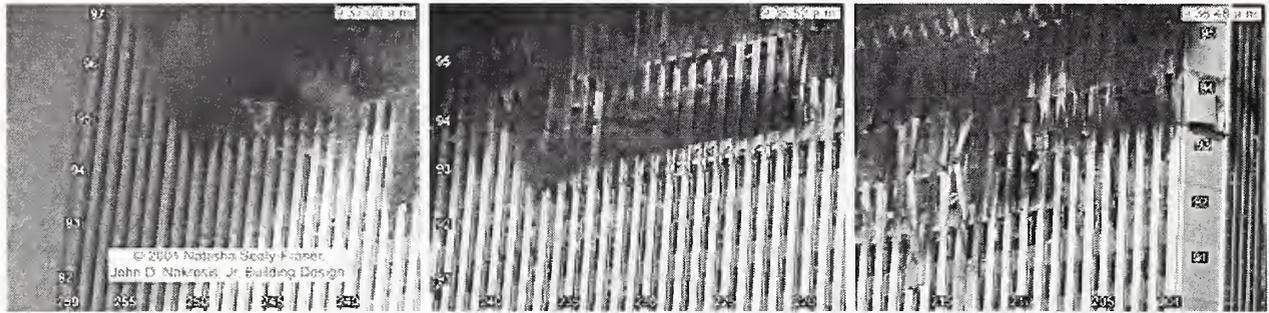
This series of three photographs shows various locations along the east face of WTC 1 around 9:37 a.m. Column and floor numbers have been added.
